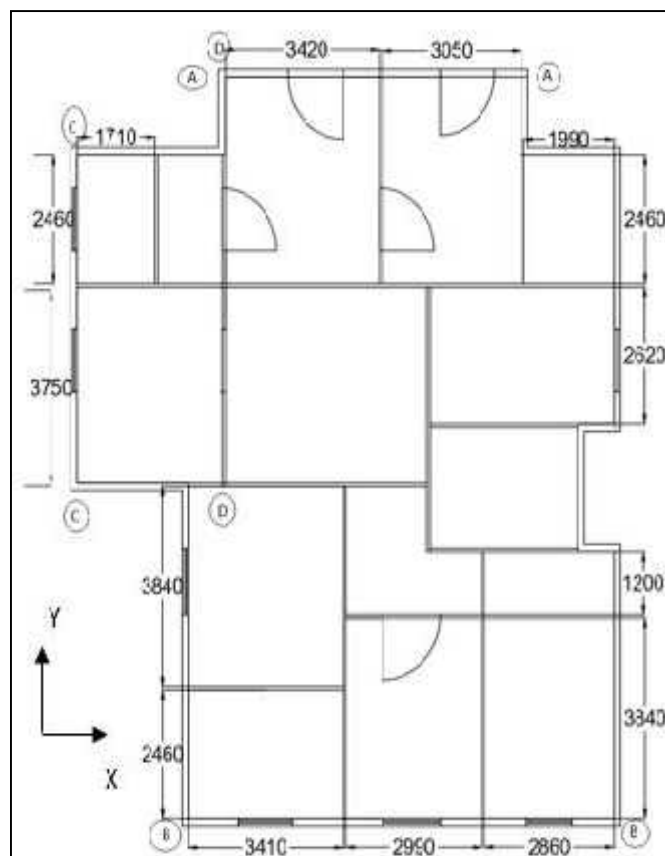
Plan of the building (all dimensions are in millimetres)
